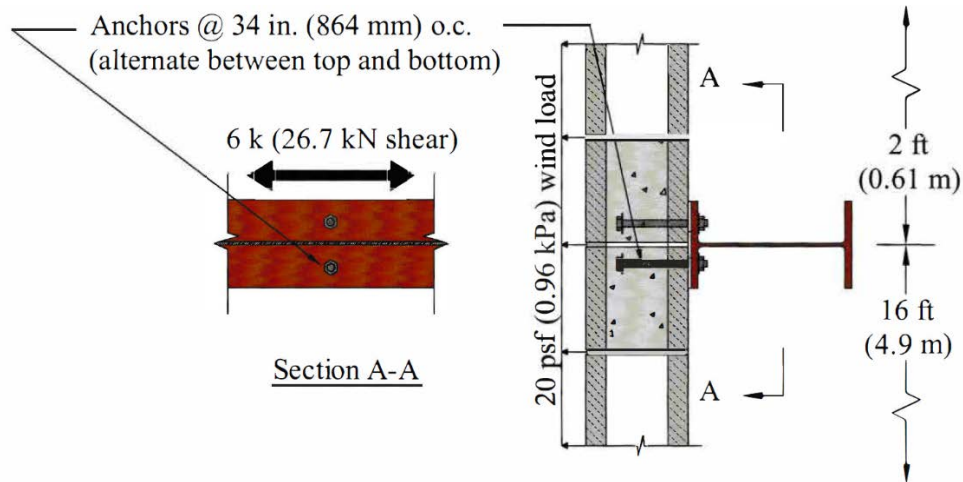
Anchor Bolt Design for Concrete Masonry Shear Wall (NCMA 2011)
